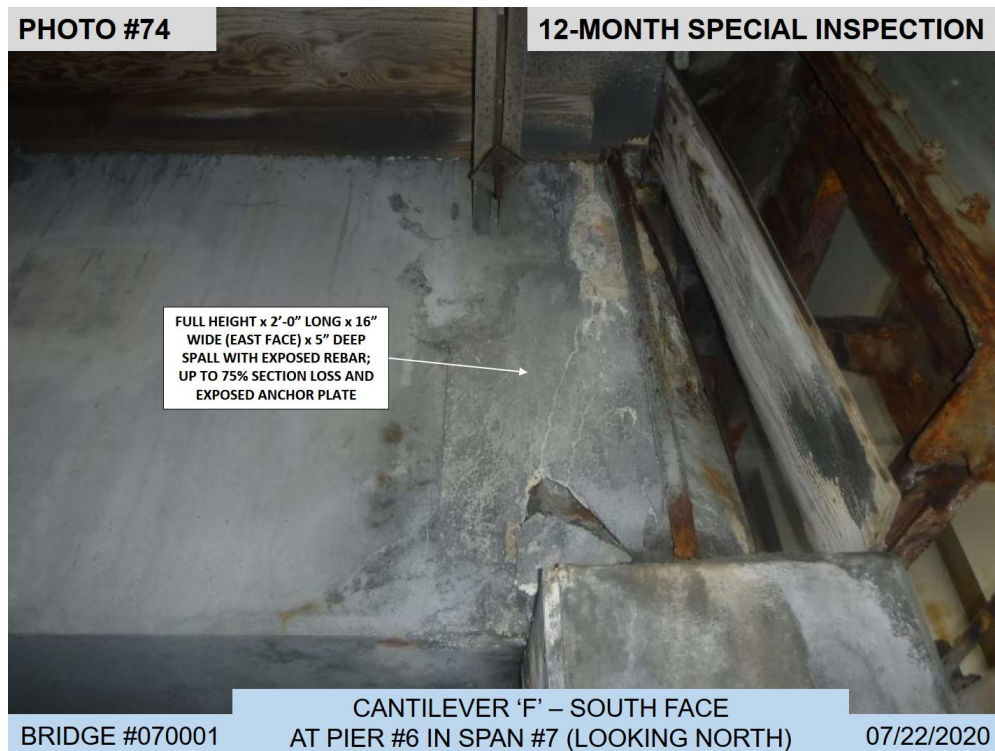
Inspection photo of exterior tie-down rod for cantilever beam F at Pier 6 taken July 2020 (AECOM).
